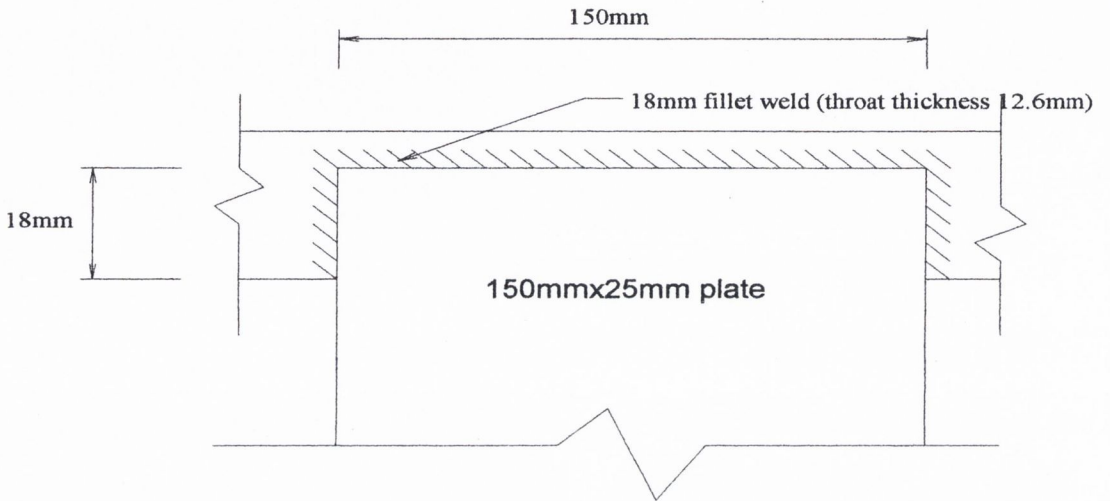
Outer edge flange stiffening plate end weld details.
